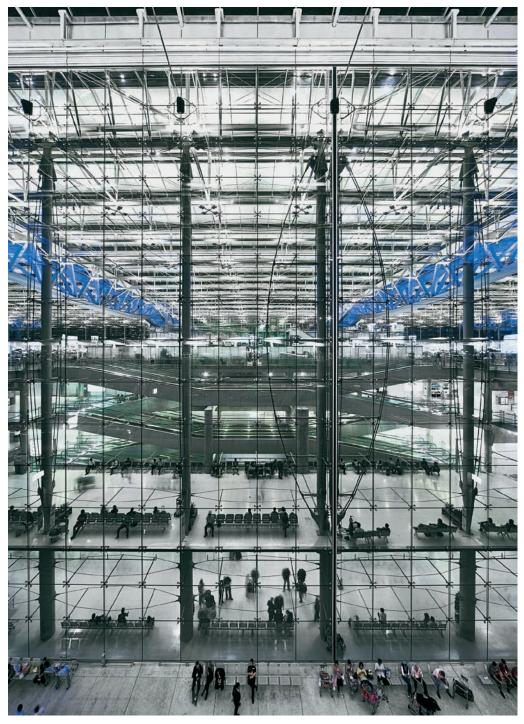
The full elevation of the facade system reveals remarkable transparency. The top band of the facade structure is designed to accommodate large design load movement and deflections of the roof structure.
